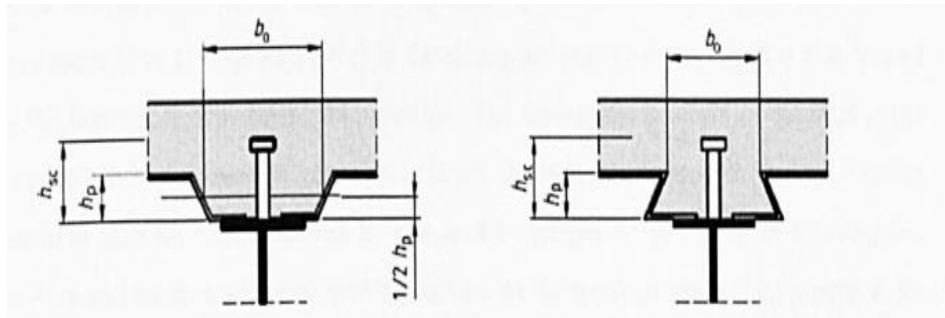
7 Composite beam with metal profile decking parallel to steel beam [14]
